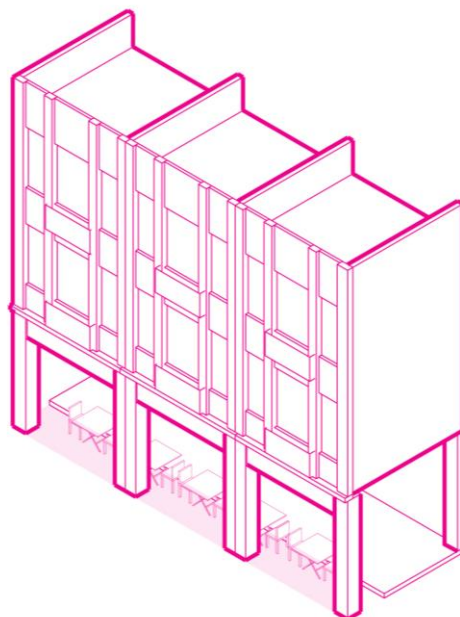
New "EATING IN THE STREET" pattern for fixed shops (Source: author)
